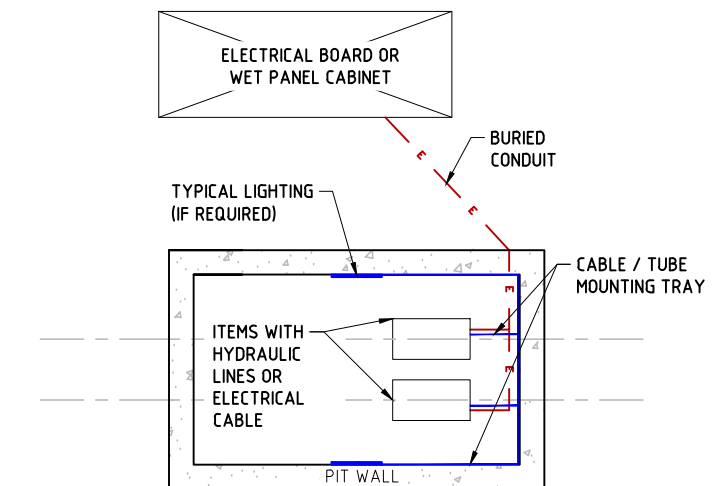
ELECTRICAL OR HYDRAULIC LINE MOUNTING
